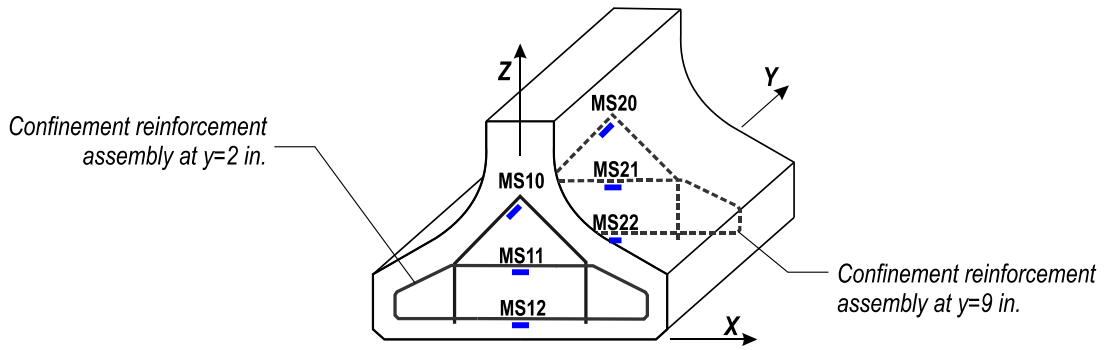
FN Confinement reinforcement strain at 2 in. and 9 in. for end of girder
